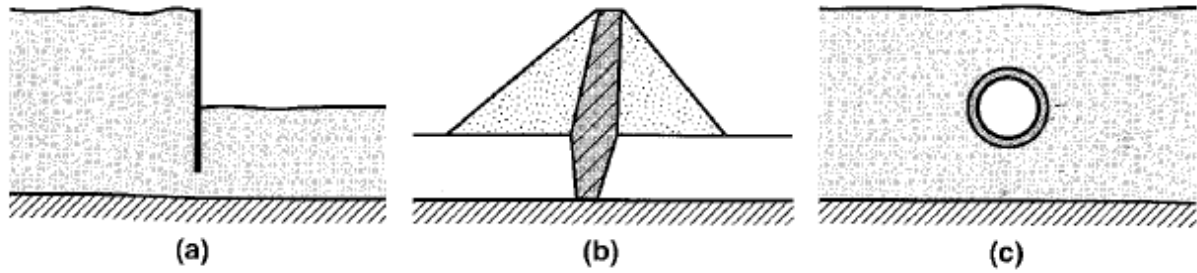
Examples of common problems typically analyzed by two-dimensional plane strain dynamic response analysis: (a) cantilever retaining wall, (b) earth dam, (c) tunnel, (Kramer, 1996)
